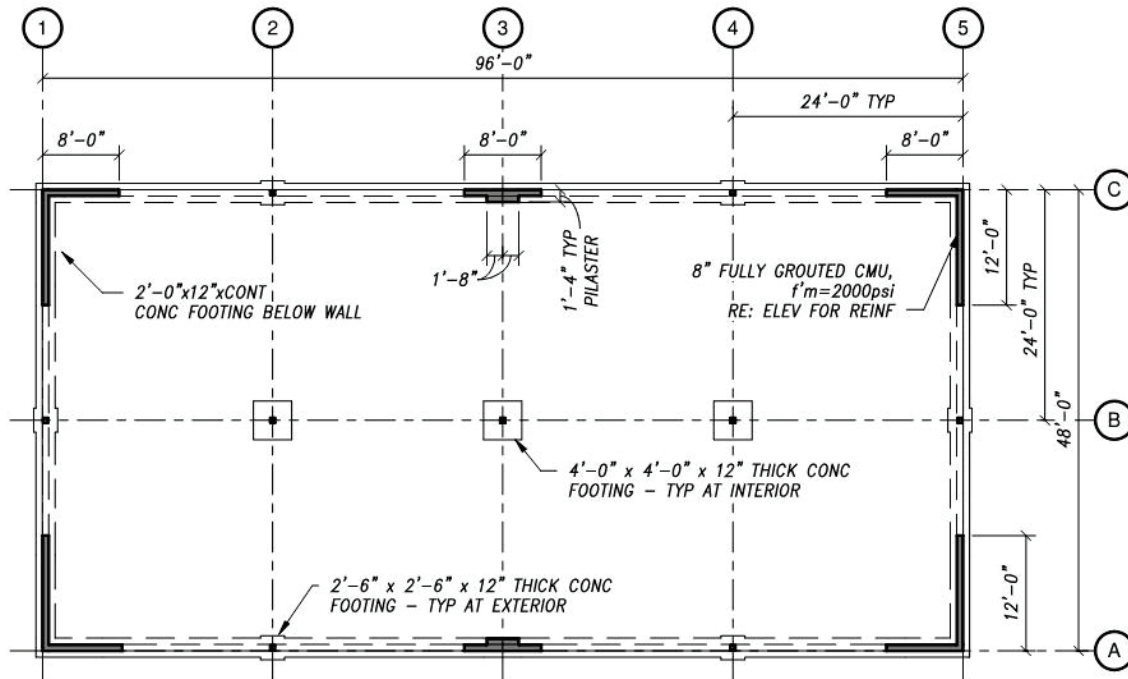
Single-story commercial building foundation plan: COM1, COM4, COM7.
